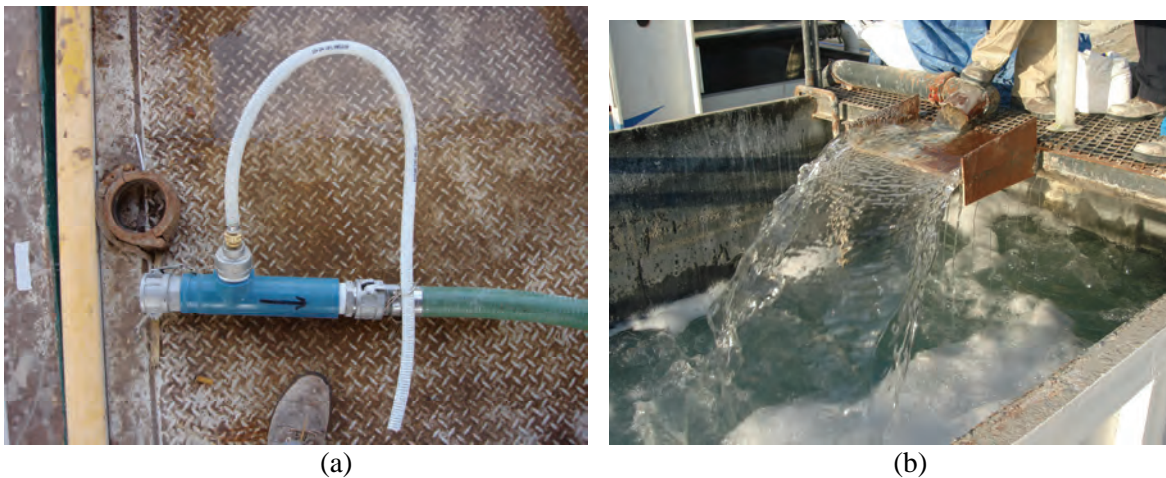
Techniques for Handling Polymer Slurry; (a) In-line Mixing Device for Adding Polymer; (b) Splash Plate for Transporting Slurry
